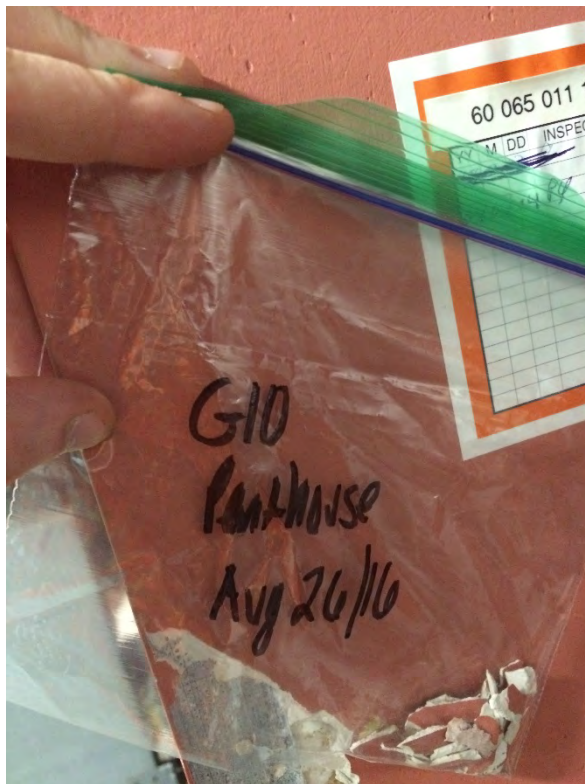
Asbestos sample A34, drywall joint compound collected from wall in penthouse of Pod G10. No asbestos detected.
